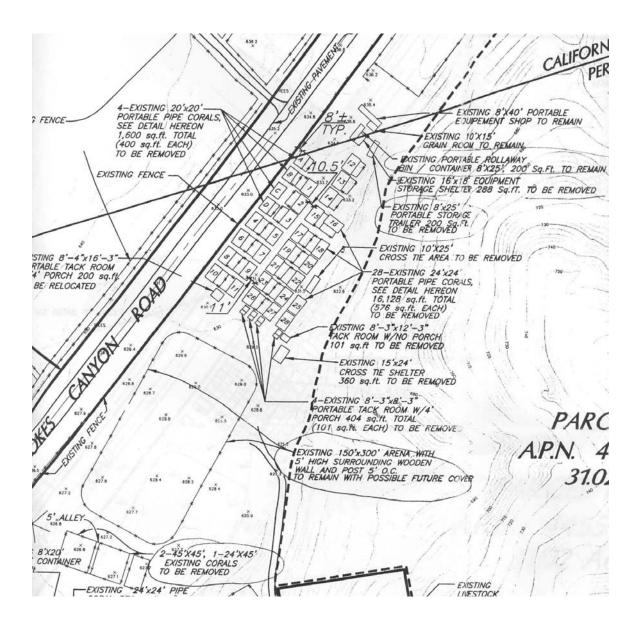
CDPA No. 4-02-131 Site Detail - North (Existing)
